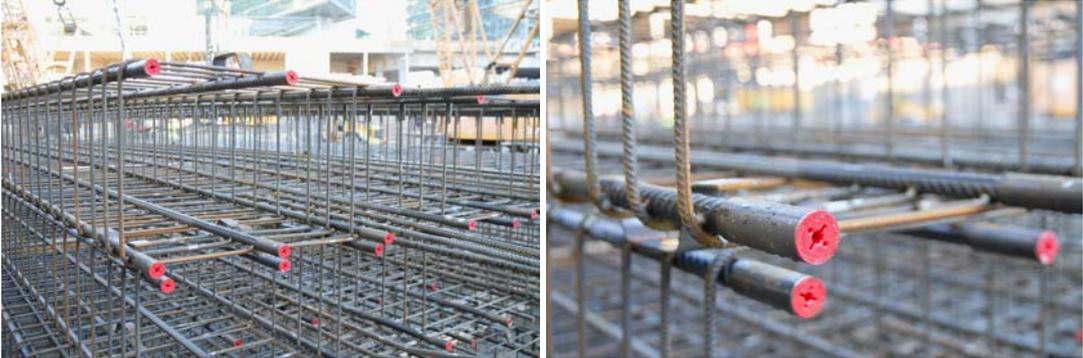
Reinforcement cage for diaphragm wall element to be coupled by screwed joints (left); detail of screwed joint (right).
